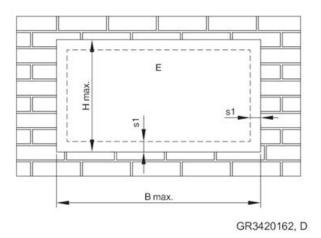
Fire batt – installation in solid walls and ceiling slabs, lightweight partition, timber stud wall, half-timbered construction and solid wood walls
